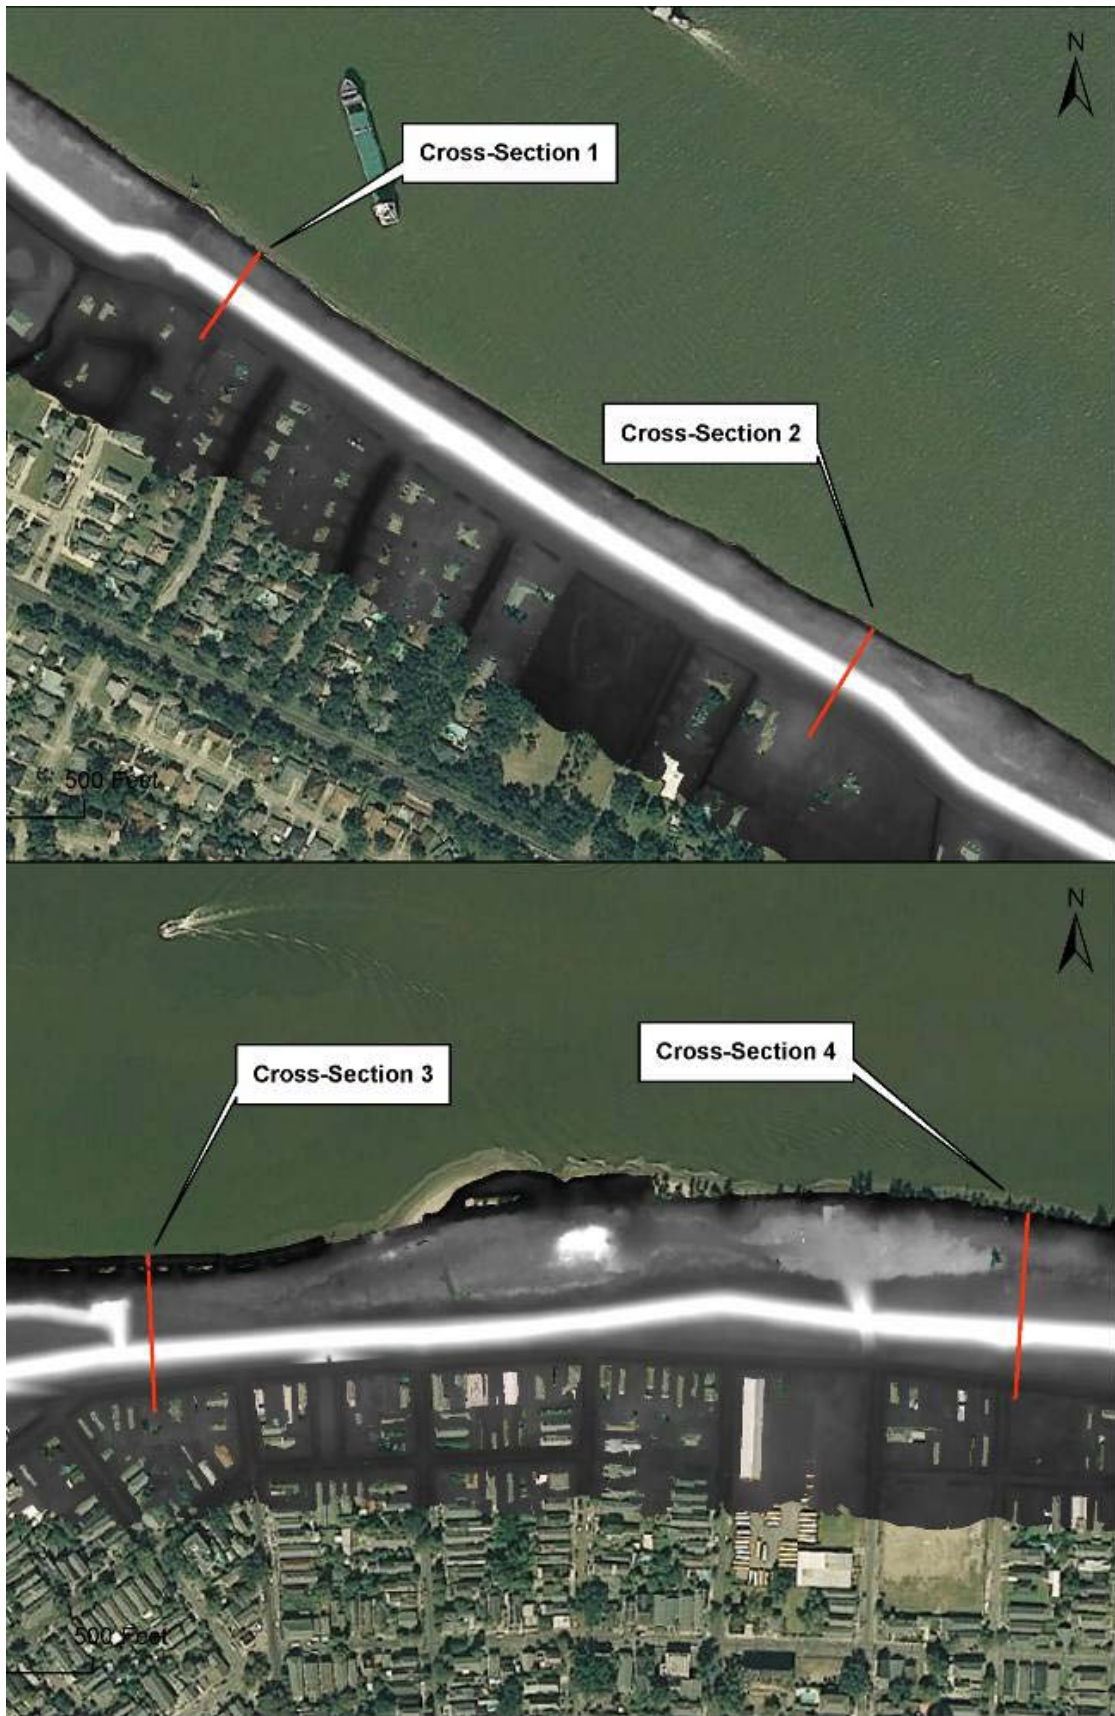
Cross-Section Locations at River Mile 90 (top) and 94 (bottom)
